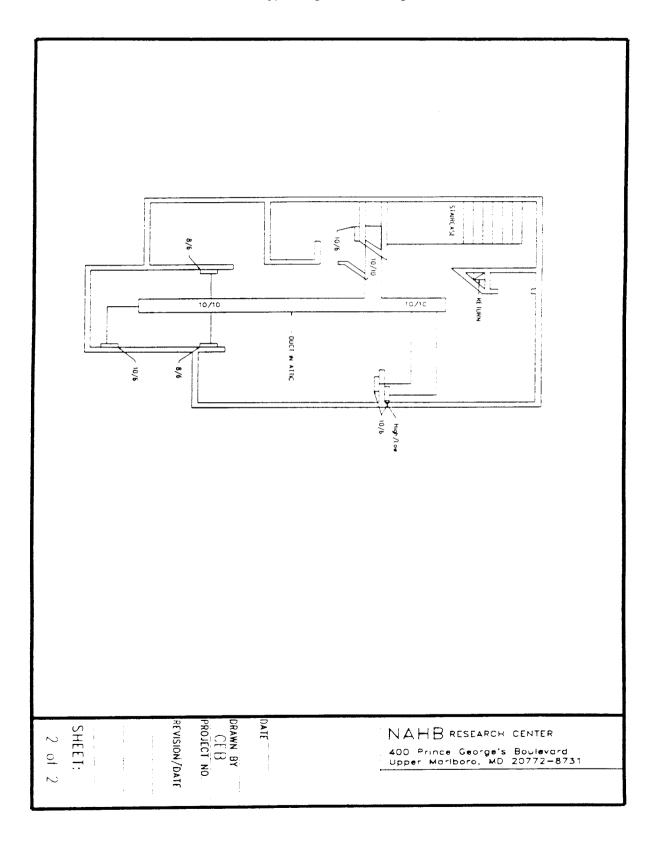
Second-Floor Air Distribution System and Floor Plan (copy of engineer's drawing)
